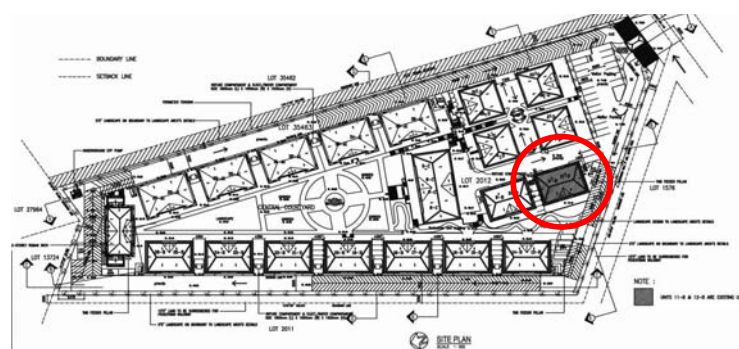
Site Plan - Whole development highlighting the location of unit modeled in study
